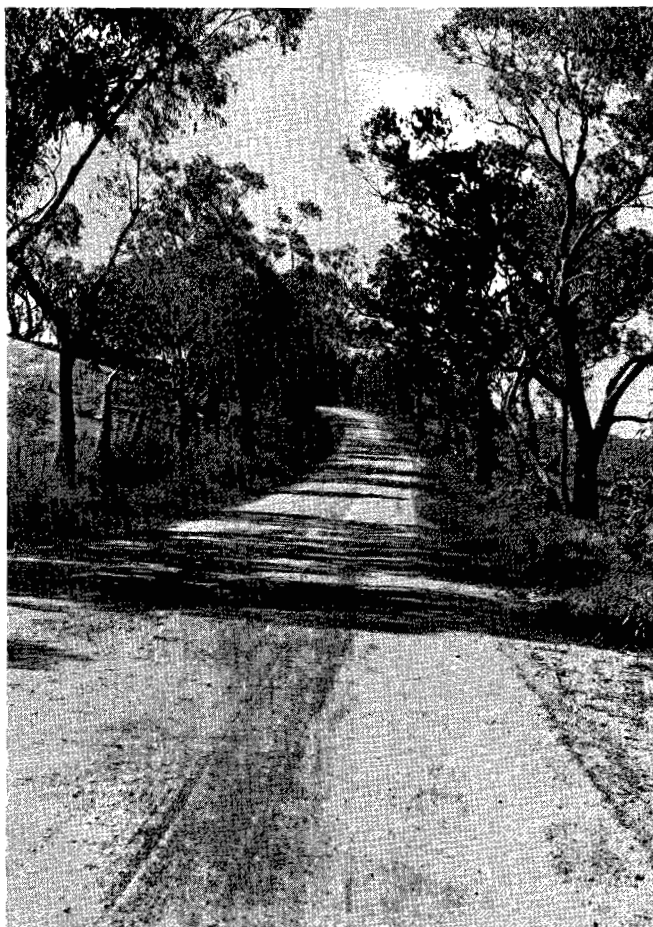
Trunk Road 52N, approaching Devil's Elbow
